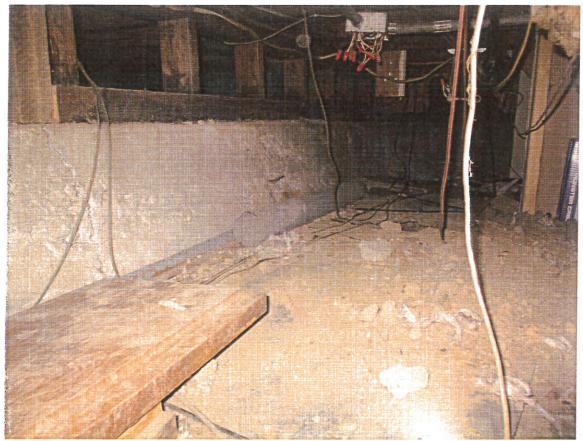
View within the foundation crawl space. Note the diagonal crack in the continuous interior footing near the left side of the photo.
